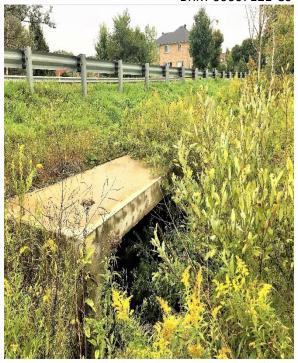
View of Box Culvert at east side of the property (looking southeast)
